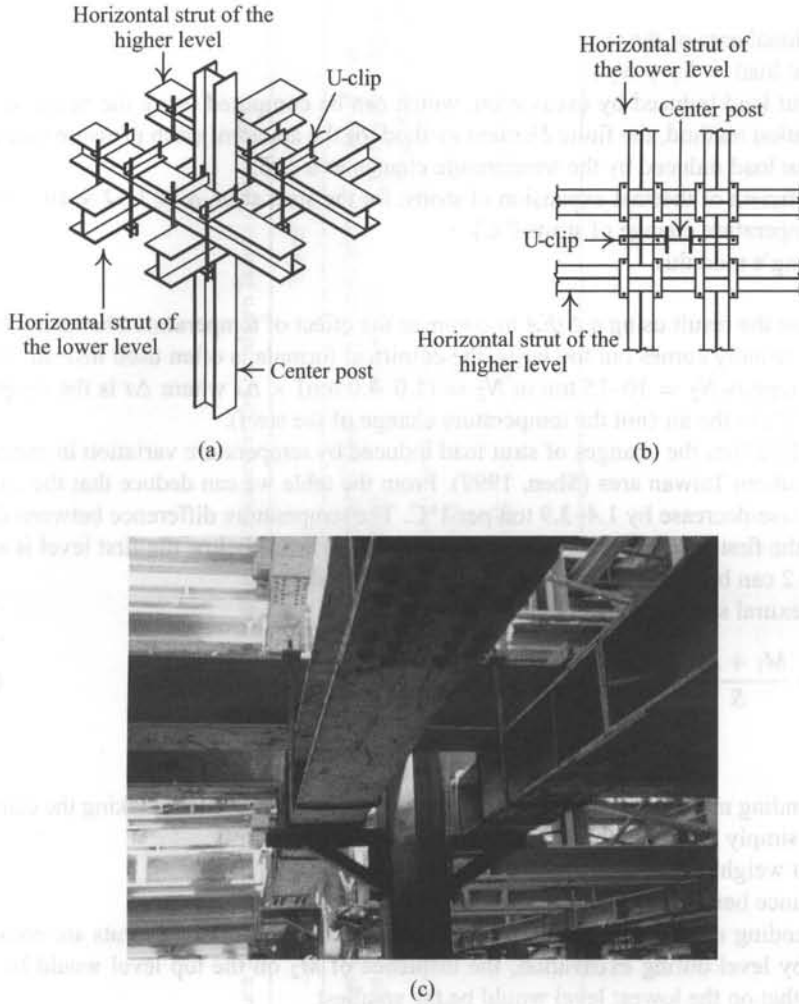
Joint of a double strut and a center post: (a) 3-D view, (b) plan view, and (c) photo.
